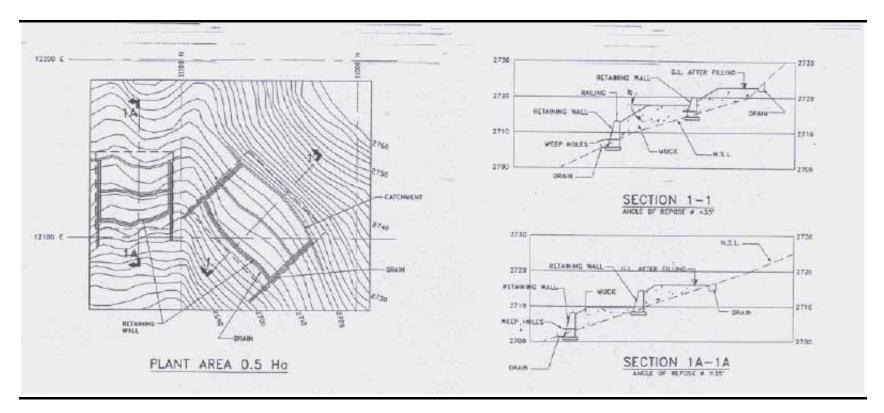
Plan and section of Plant Area (PA-2) near Khanun (on way to Duhangan weir) showing muck disposal arrangement
